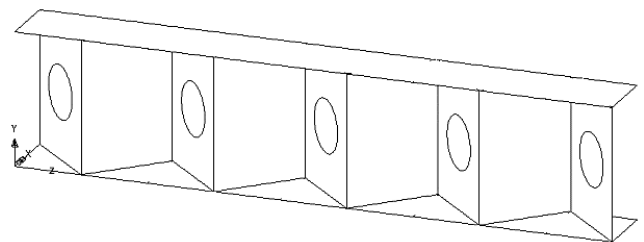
The isometric view of TriWP with perforation of circular shaped arranged in Layout 2
